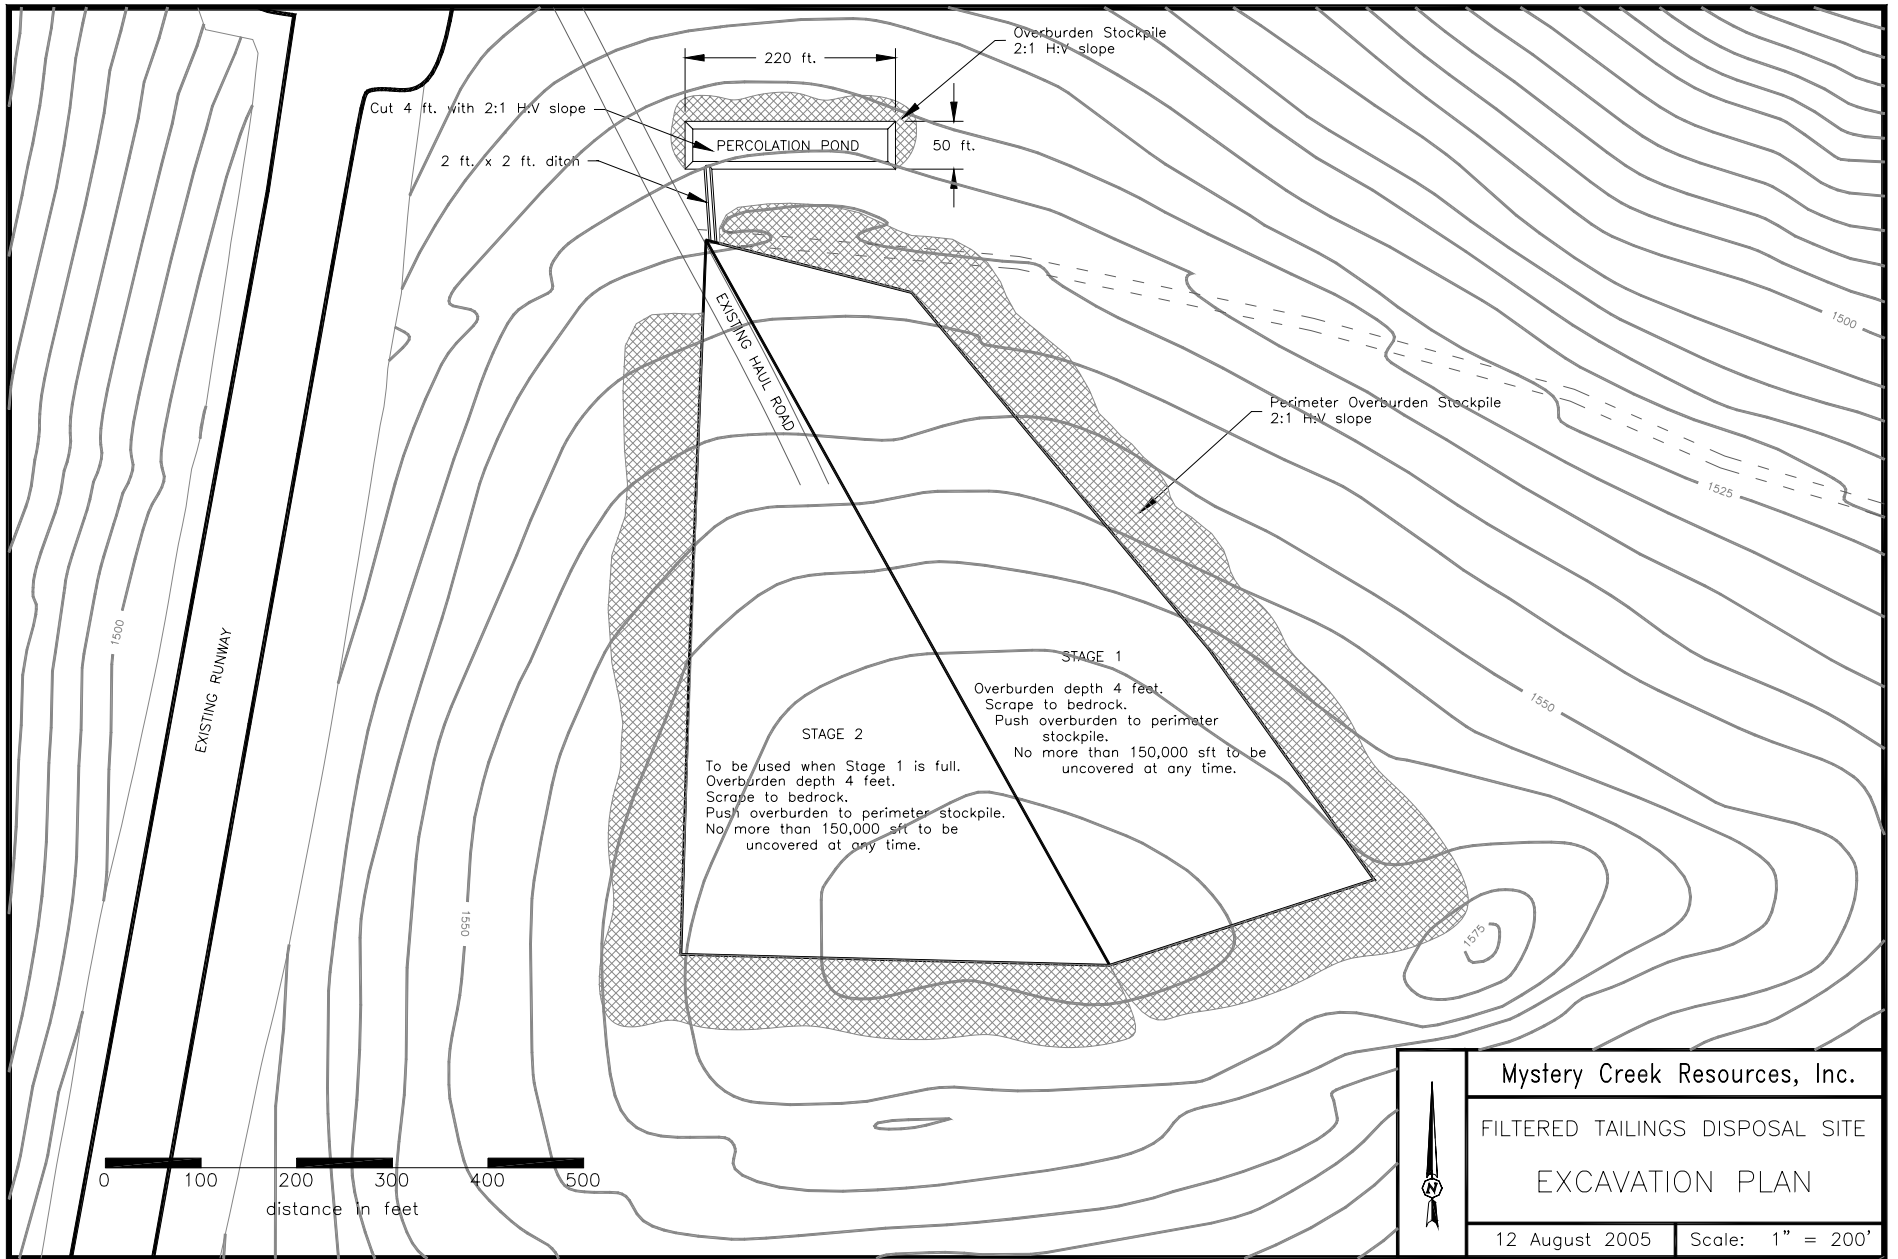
FILTERED TAILINGS DISPOSAL SITE EXCAVATION PLAN
